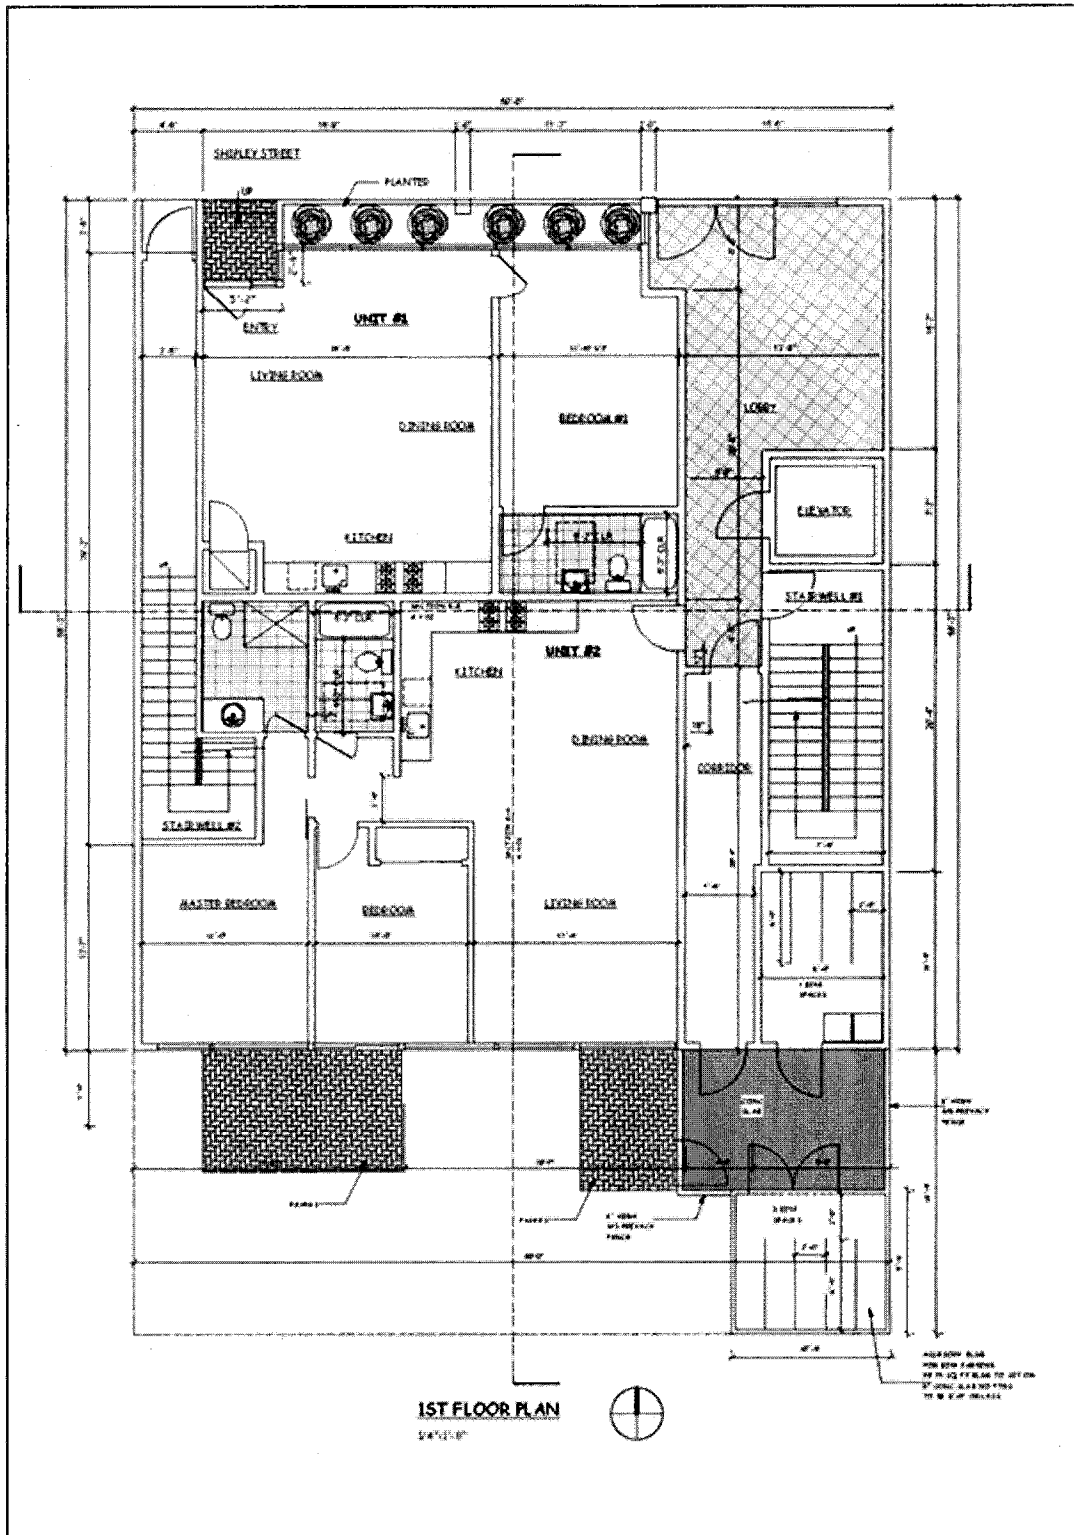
Proposed first floor plan (Source: William Pashelinsky Architect)
